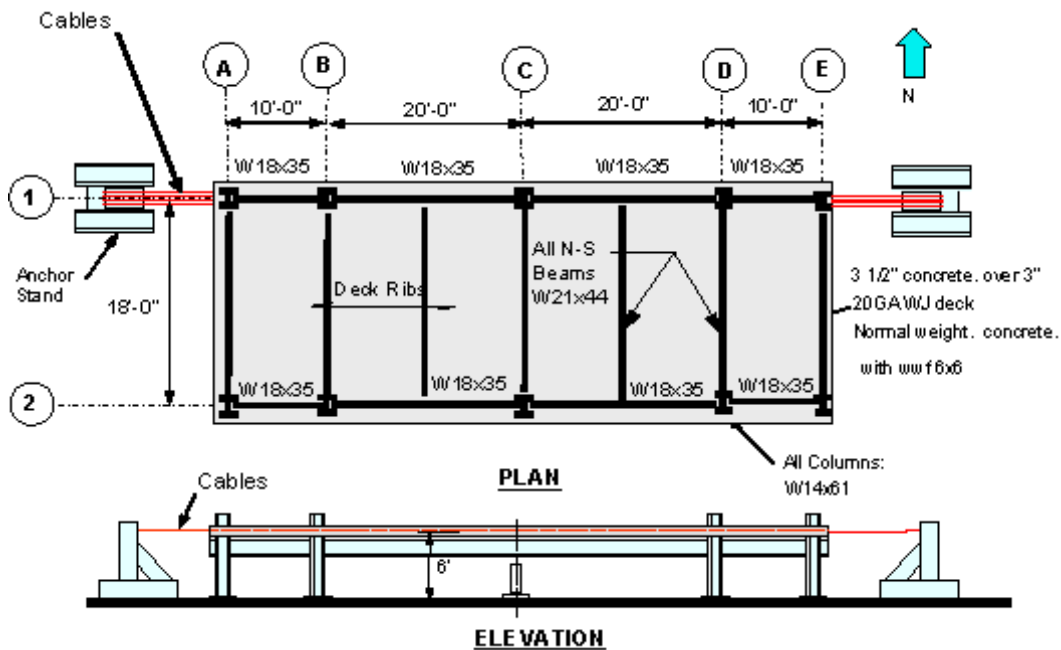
Plan and Elevation of Test Specimen (Astaneh 2007)
